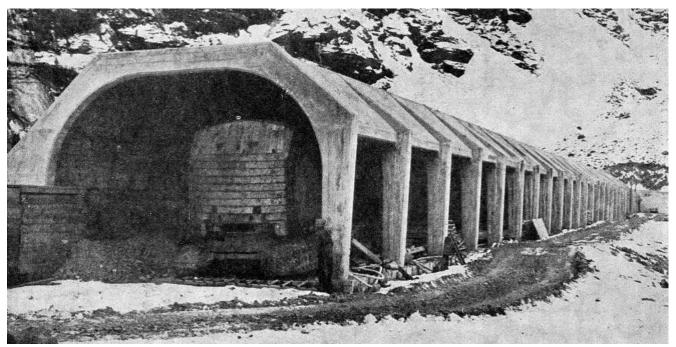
Eastern tunnel avalanche protection 17th July 1940 (Source: Auckland Council)
